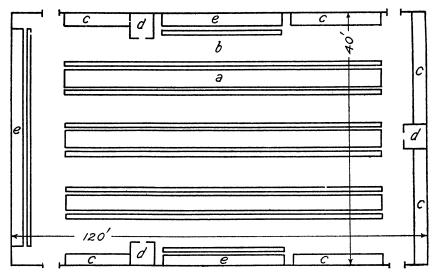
Dryhouse at Ely, Minn., Vermillion Range: a, Double row of lockers; b, benches; c, wash trough; d, shower stalls; e, lockers.
